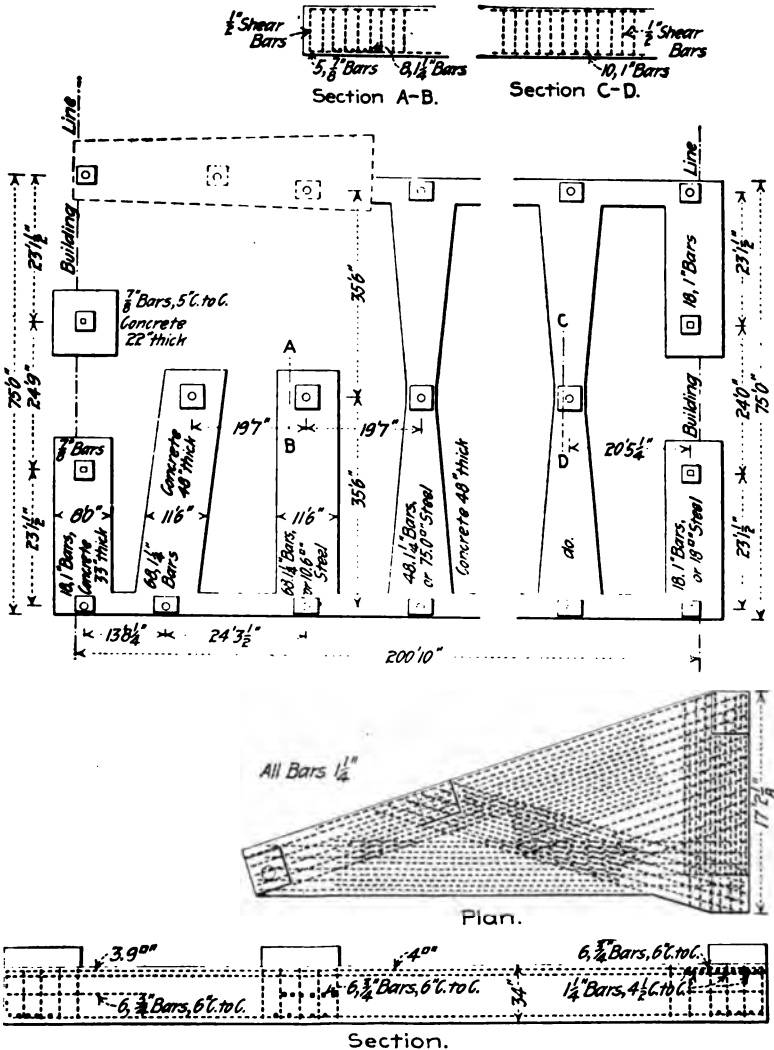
Foundation for Garage, Decauville Automobile Co., New York was found under the part of the building where this footing was to have been used.
